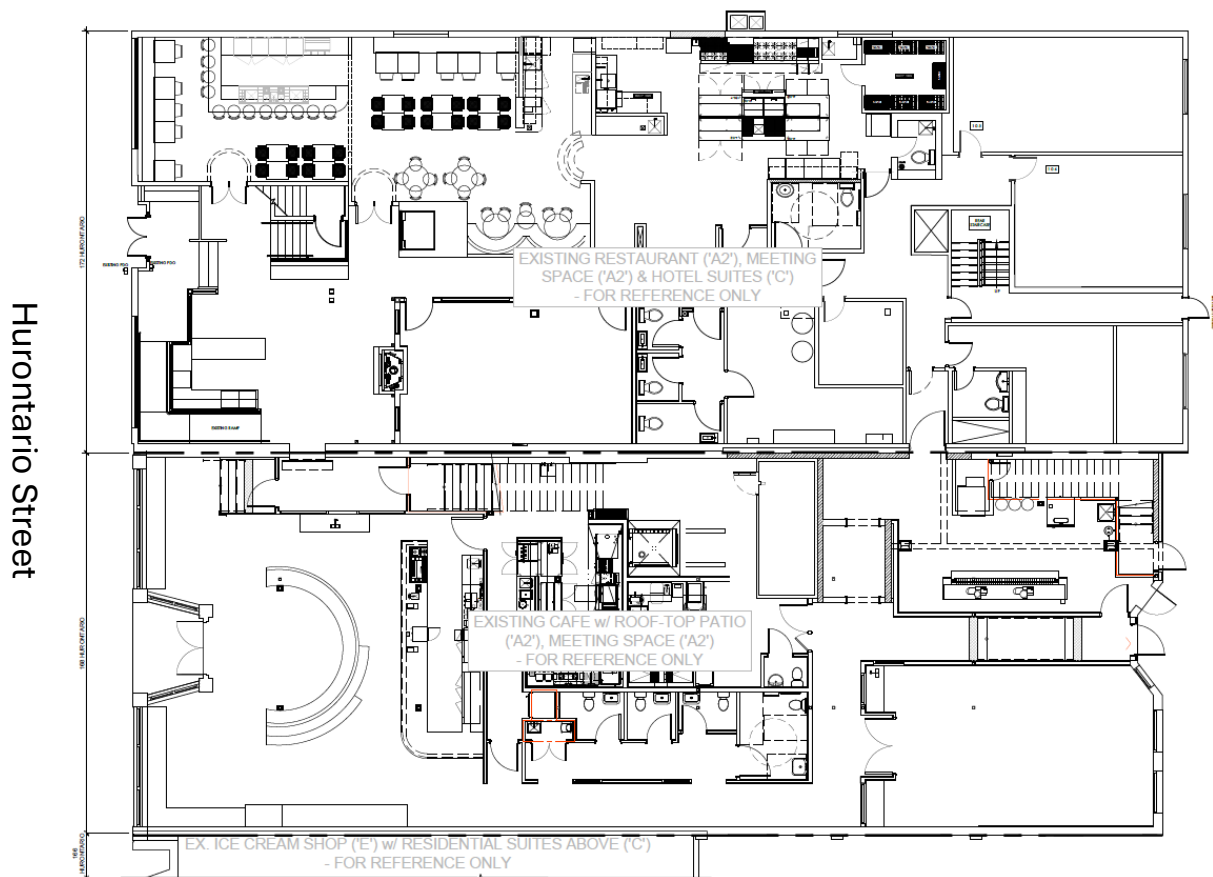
Existing Ground Floor Plan. All existing except as noted on proposed plan.
